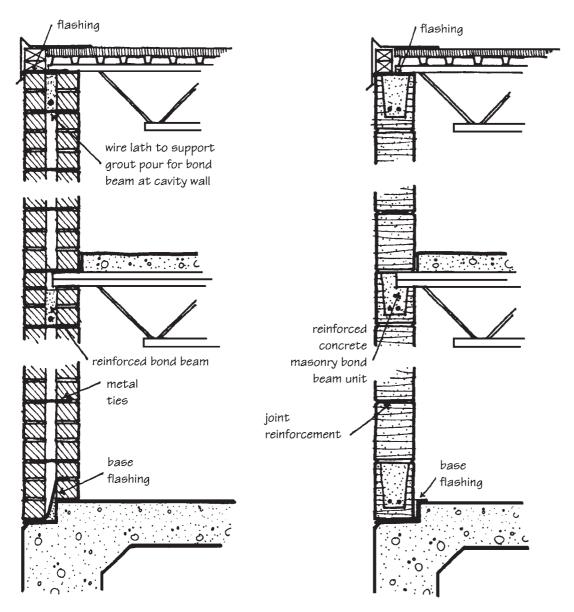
Reinforced bond beams help limit brick expansion and CMU shrinkage cracking.
